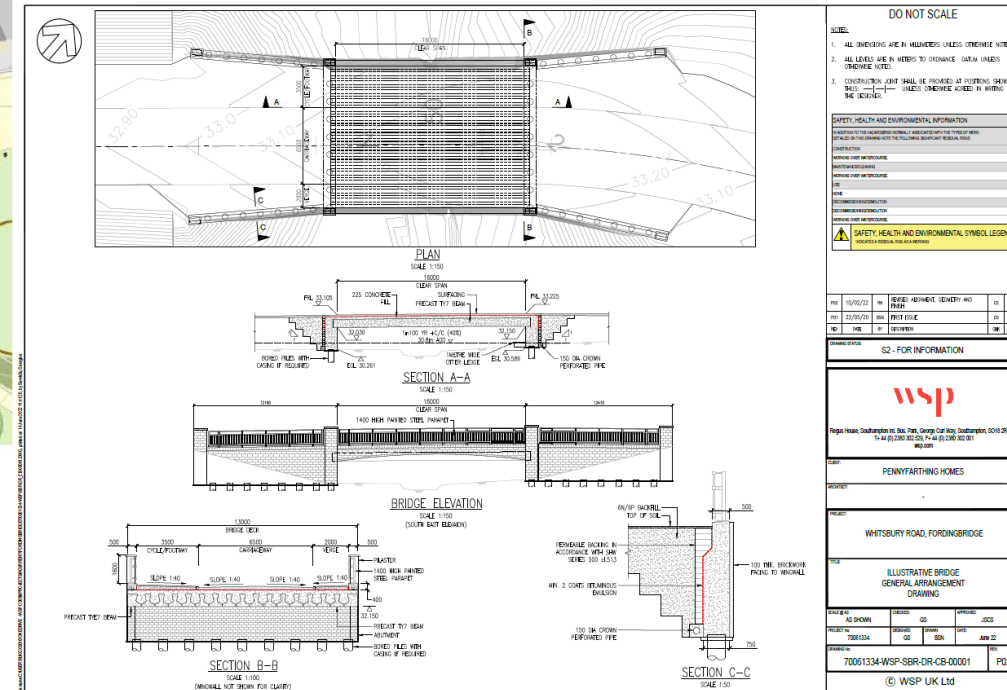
Bridge: elevation: minor reduction in height from previously submitted version
